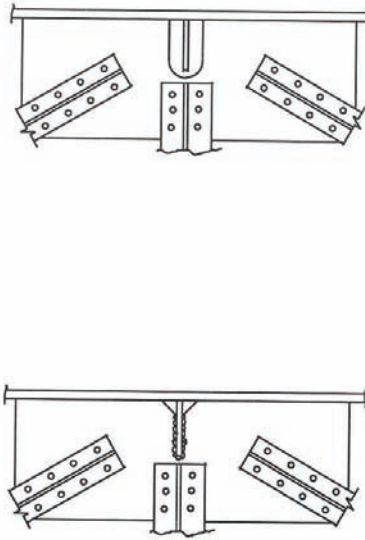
Lateral Bracing Gusset at Floorbeam or Diaphragm Connection Plate
